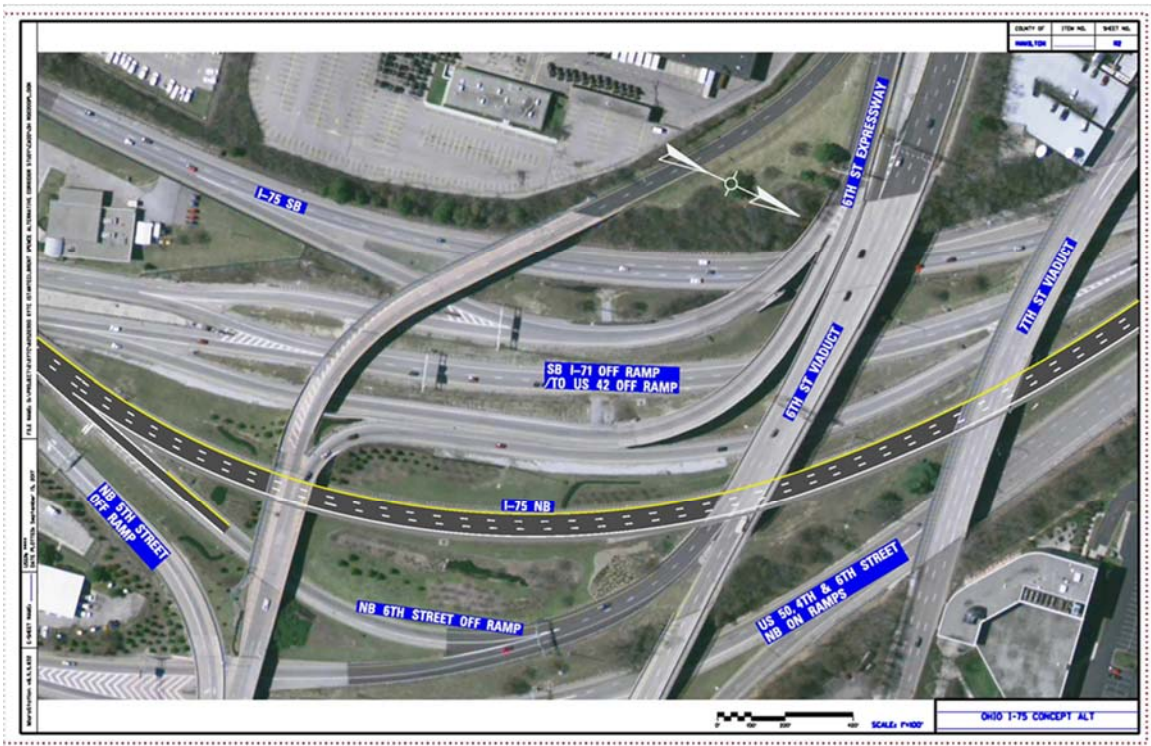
Northbound I-75 Widening between 5th Street and 7th Street
